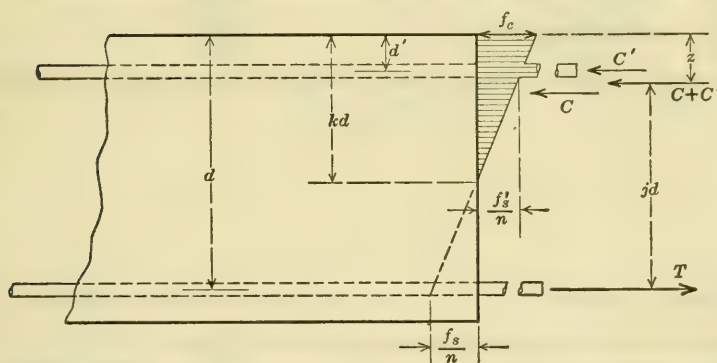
NOMENCLATURE FOR CONCRETE BEAM REINFORCED FOR TENSION AND COMPRESSION.
